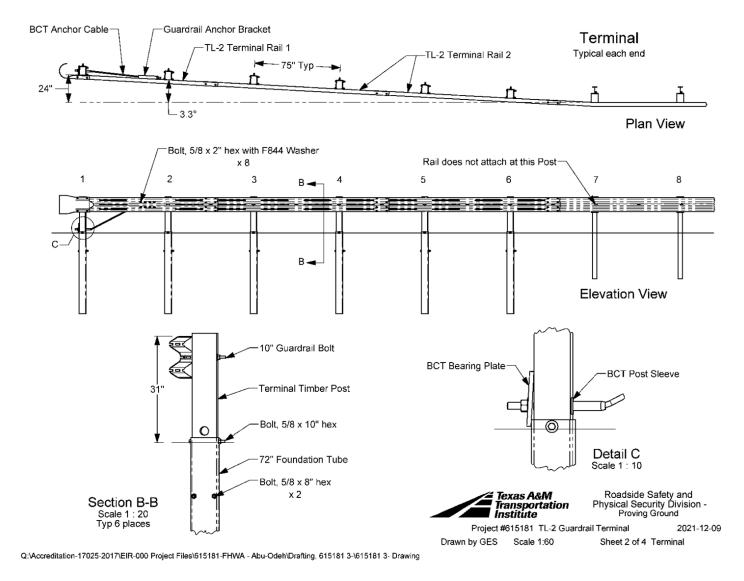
Upstream Terminal Details of TL-2 Terminal on MGS for Crash Test 615181-01-10.
